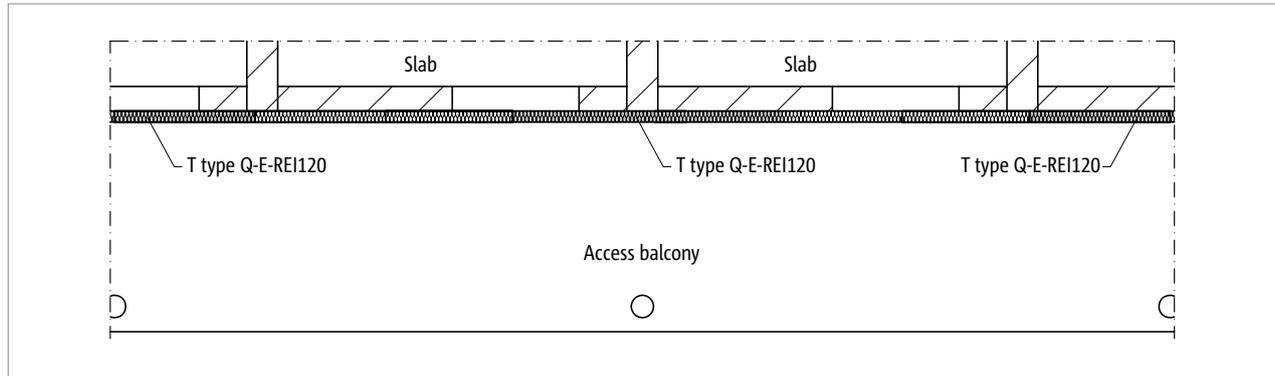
Schöck Isokorb® T type Q-E-REI120: Room-closing passageway walk
